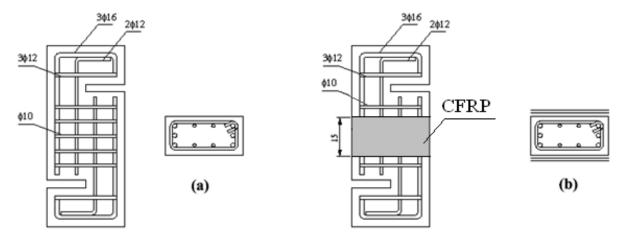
Typical push-off specimens; (a) group R (b) group RC.
